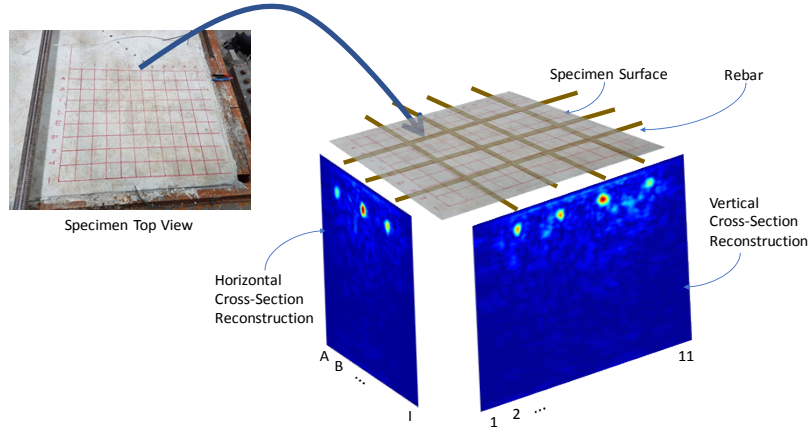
Desired reconstruction of Thick-Reinforced Concrete Structure.
